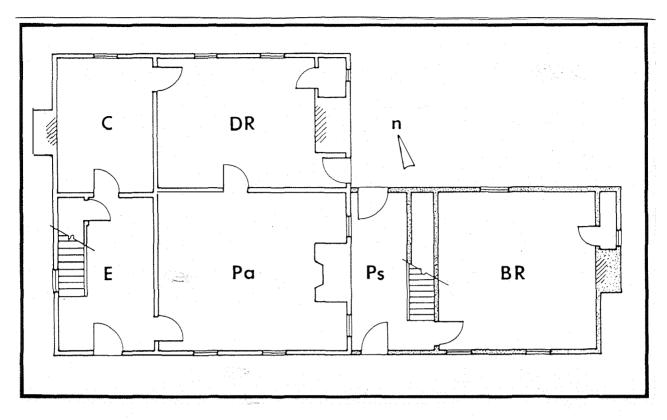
Floor plan of Timberneck, Structure 36-74 (Upton 1986:330).
